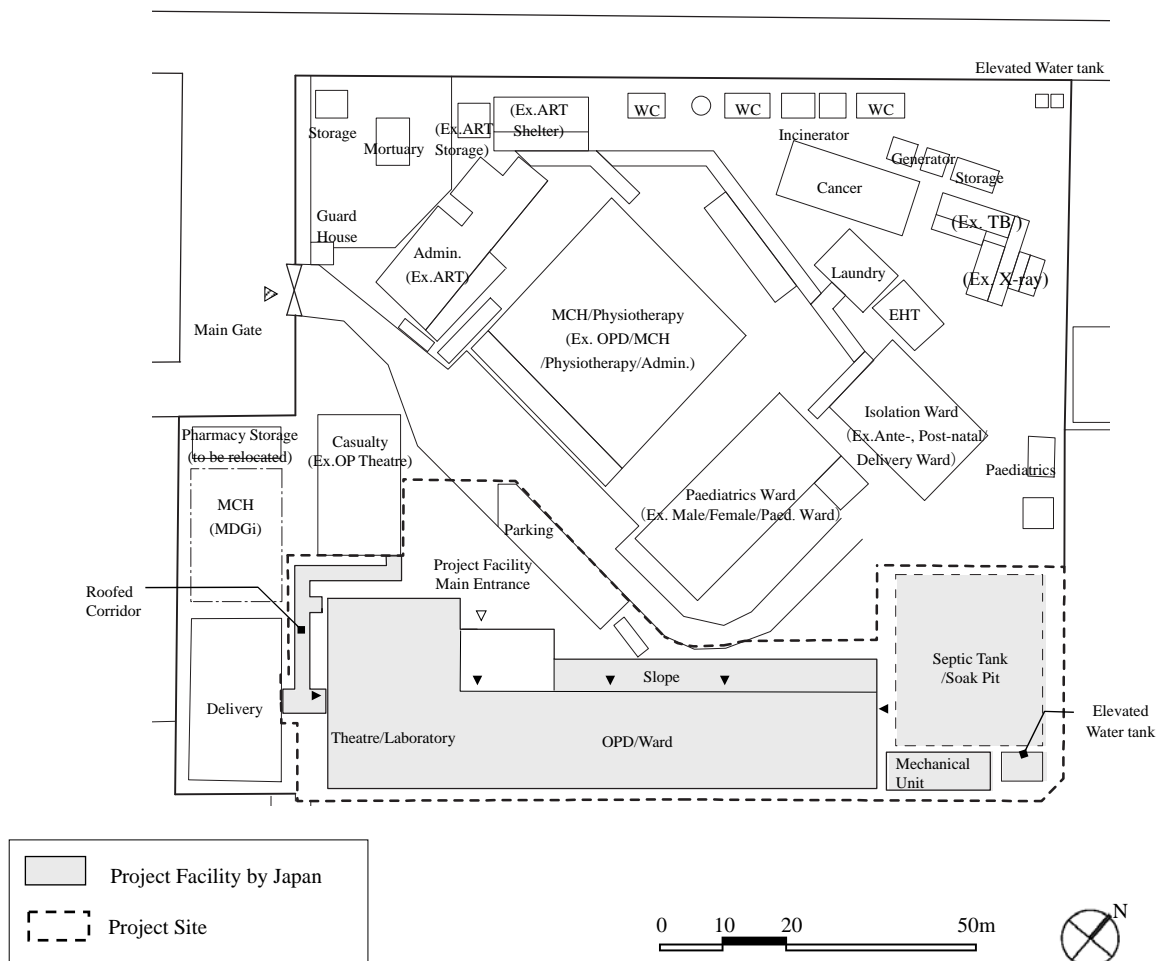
Existing Facilities and the Layout Plan of Kanyama Lv1H Project Facilities
